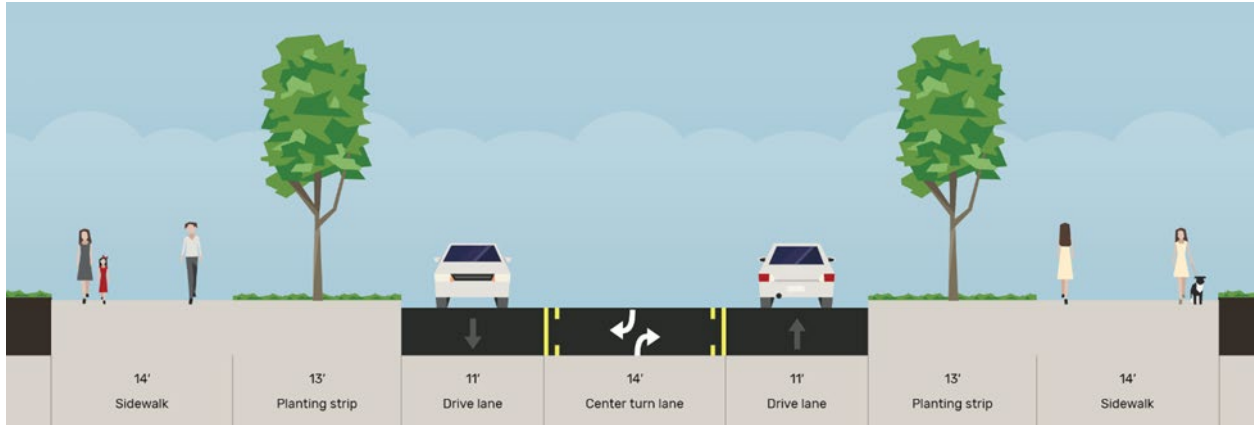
Cross section diagram of design recommendations with no bike lanes or on-street parking (assuming 90’ from outside of sidewalk to outside of sidewalk).
